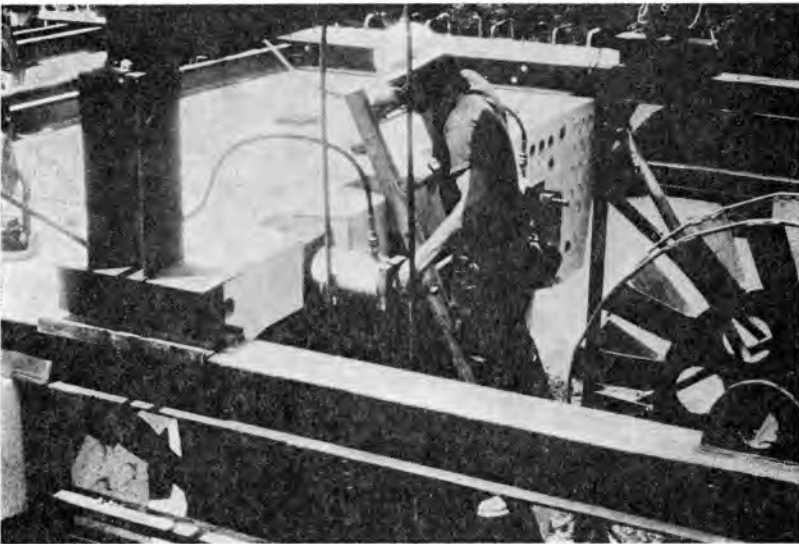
This photo shows the temporary prestressing being applied. This will hold the segment in place until the tendons are installed and stressed.
